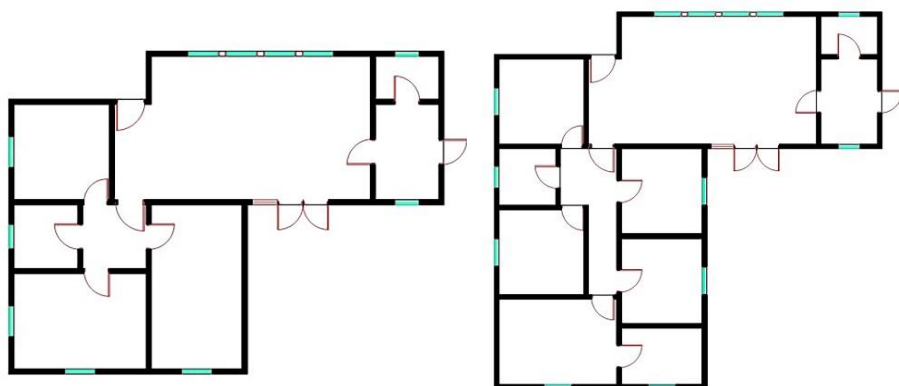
Plan views of the house types “3” and “5”. Source: Prepared by the authors.
